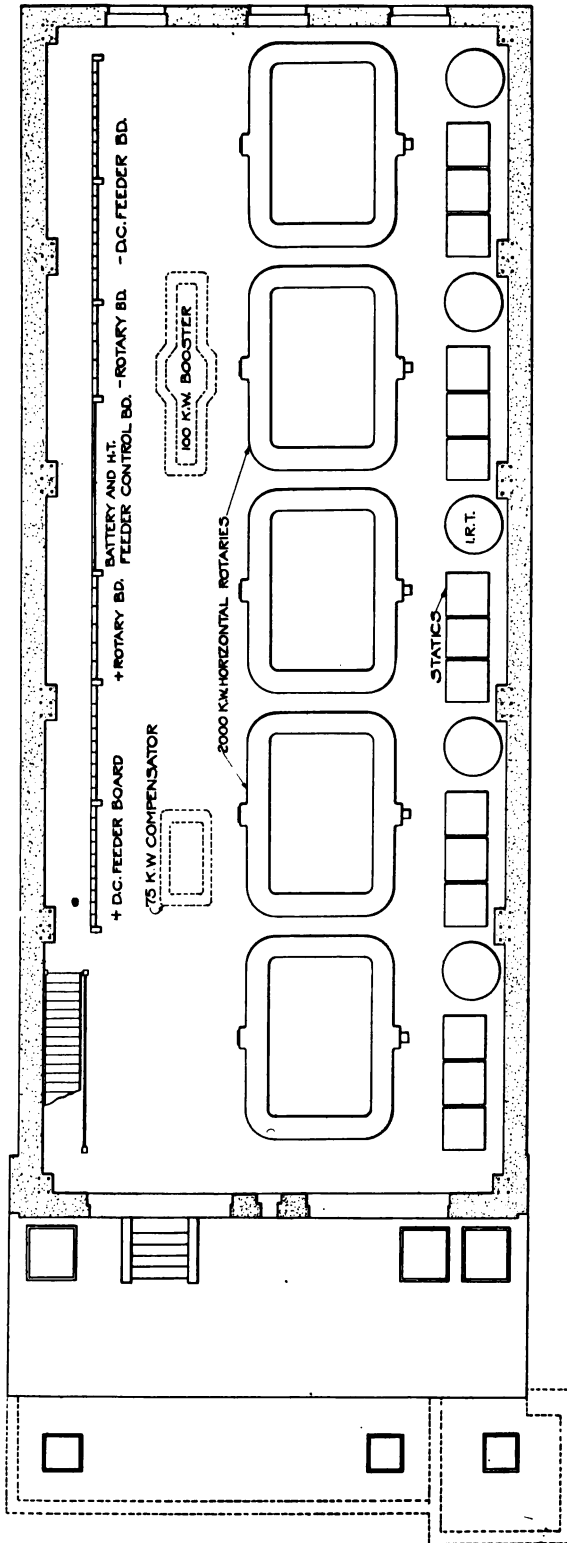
General Plan, Sixty-fourth Street Substation.
